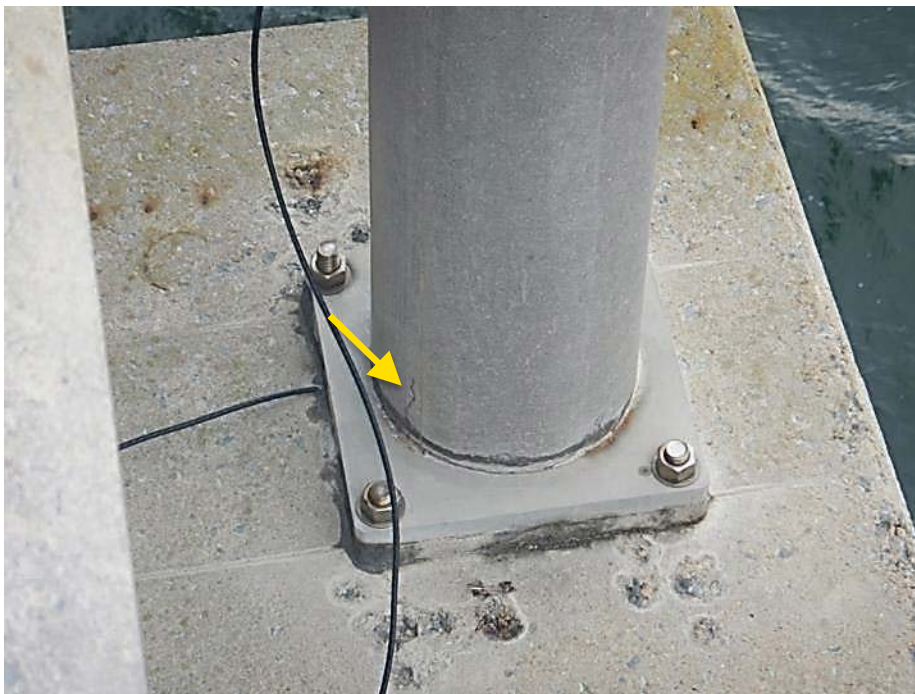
CSB117 Light Pole – Vertical Cracking Near Baseplate (Looking North)
